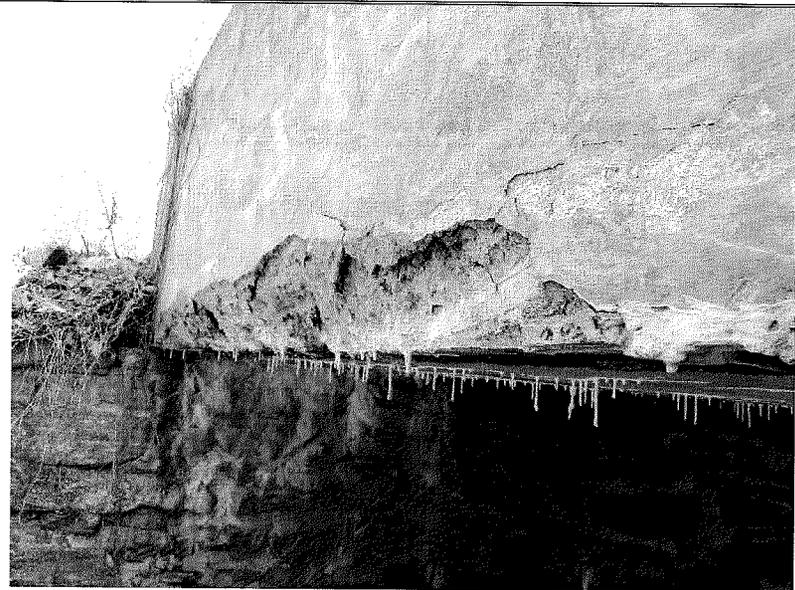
Upstream parapet with severe cracking and deterioration.
